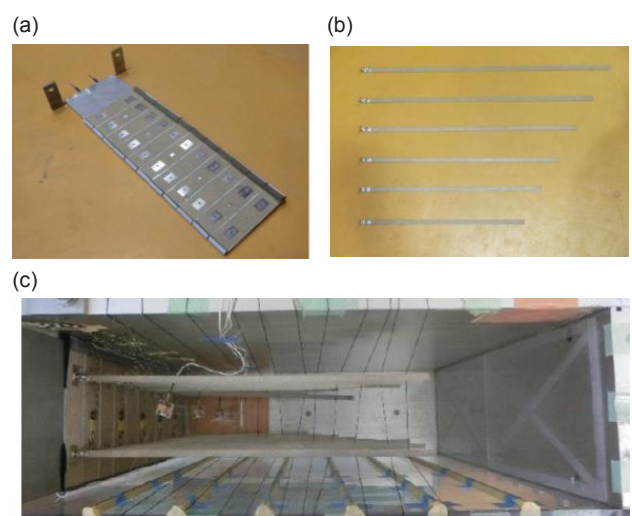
Experimental setup of (a) wall model, (b) reinforcement, and (c) arrangement of measuring instrument before banking (Black strings were used to support the horizontality of the reinforcements under air pluviation.).
